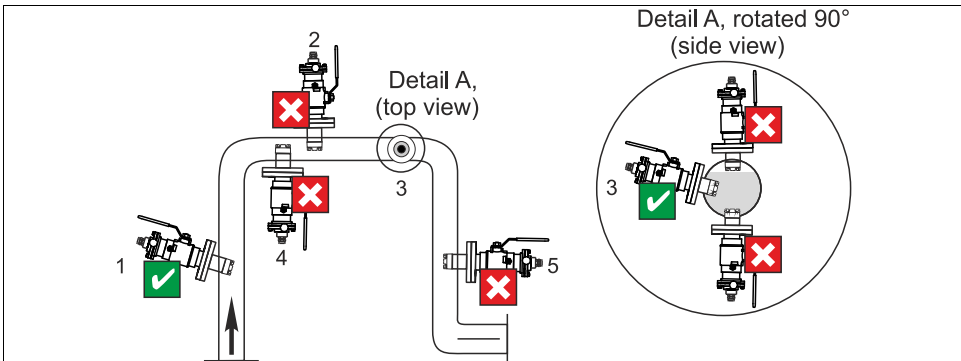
Permissible and impermissible sensor installation positions with retractable assembly COA451
